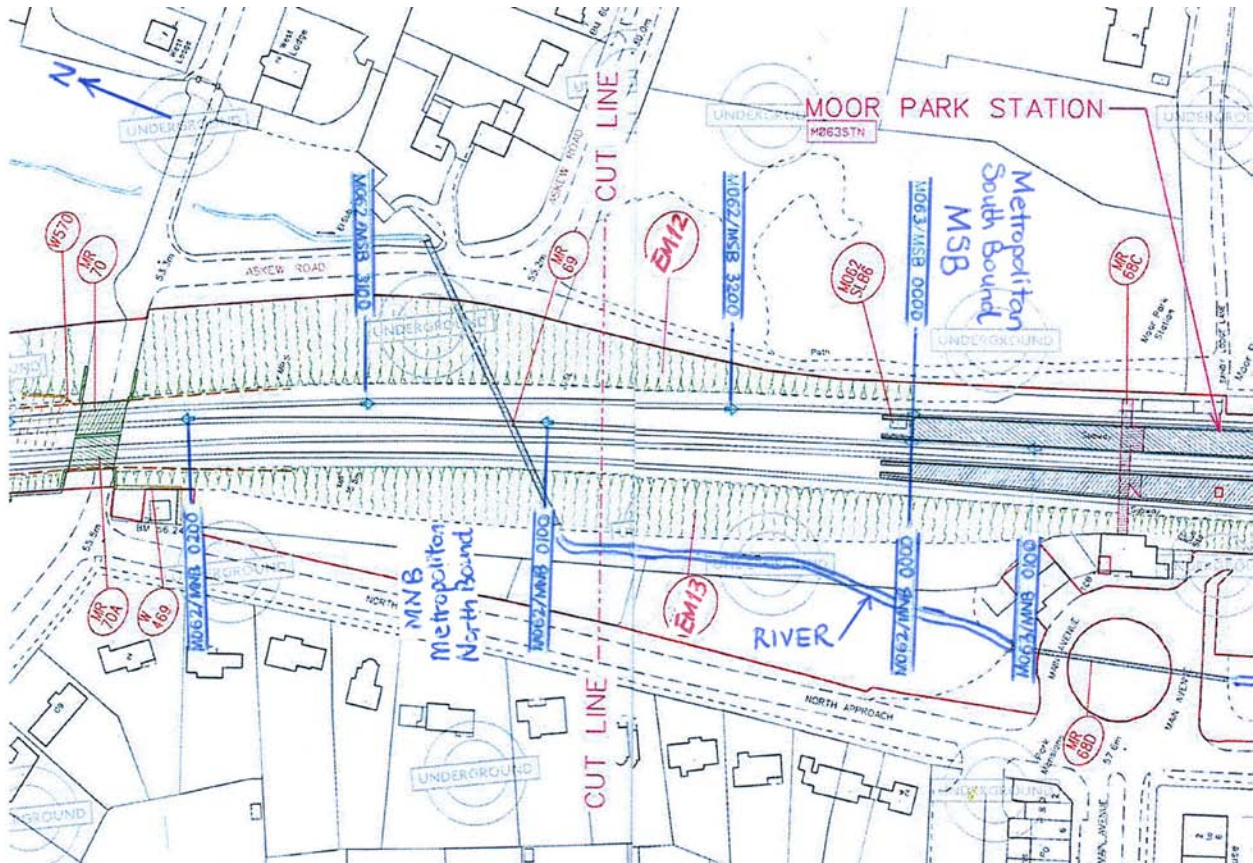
Asset location plan for embankments EM12 and EM13 between Moor Park and Rickmansworth station
